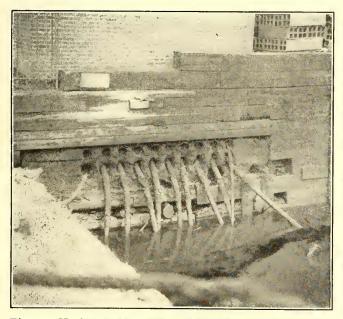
Harlem Cables—West Cable House, Showing Duct Entrances
